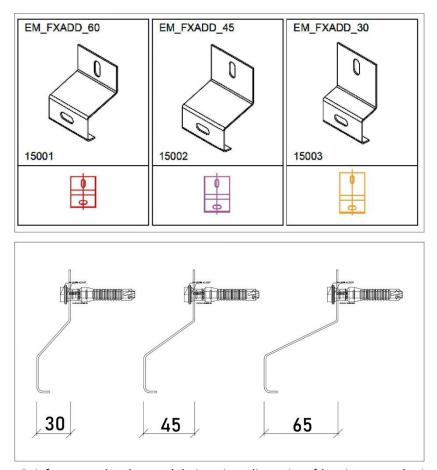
Detail drawing of the façade system's bracket [drawing created using AutoCAD]
